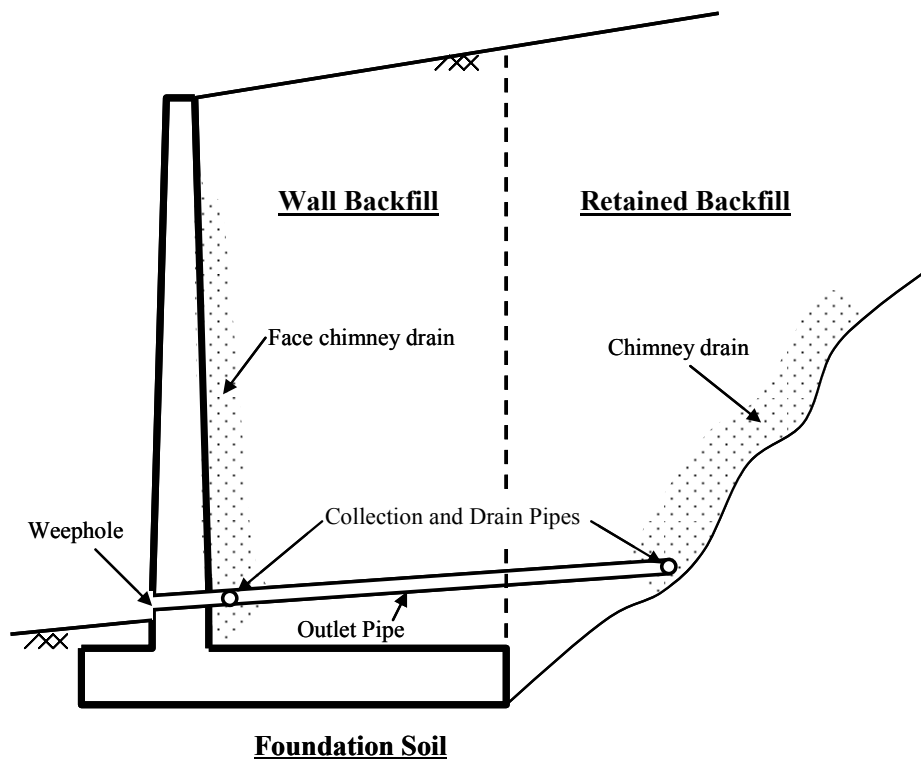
Drains behind backfill in cantilever wall in a cut situation.
